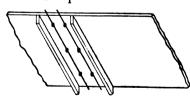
Conductors Protected by Wooden Guard Strips on Low Ceiling.
